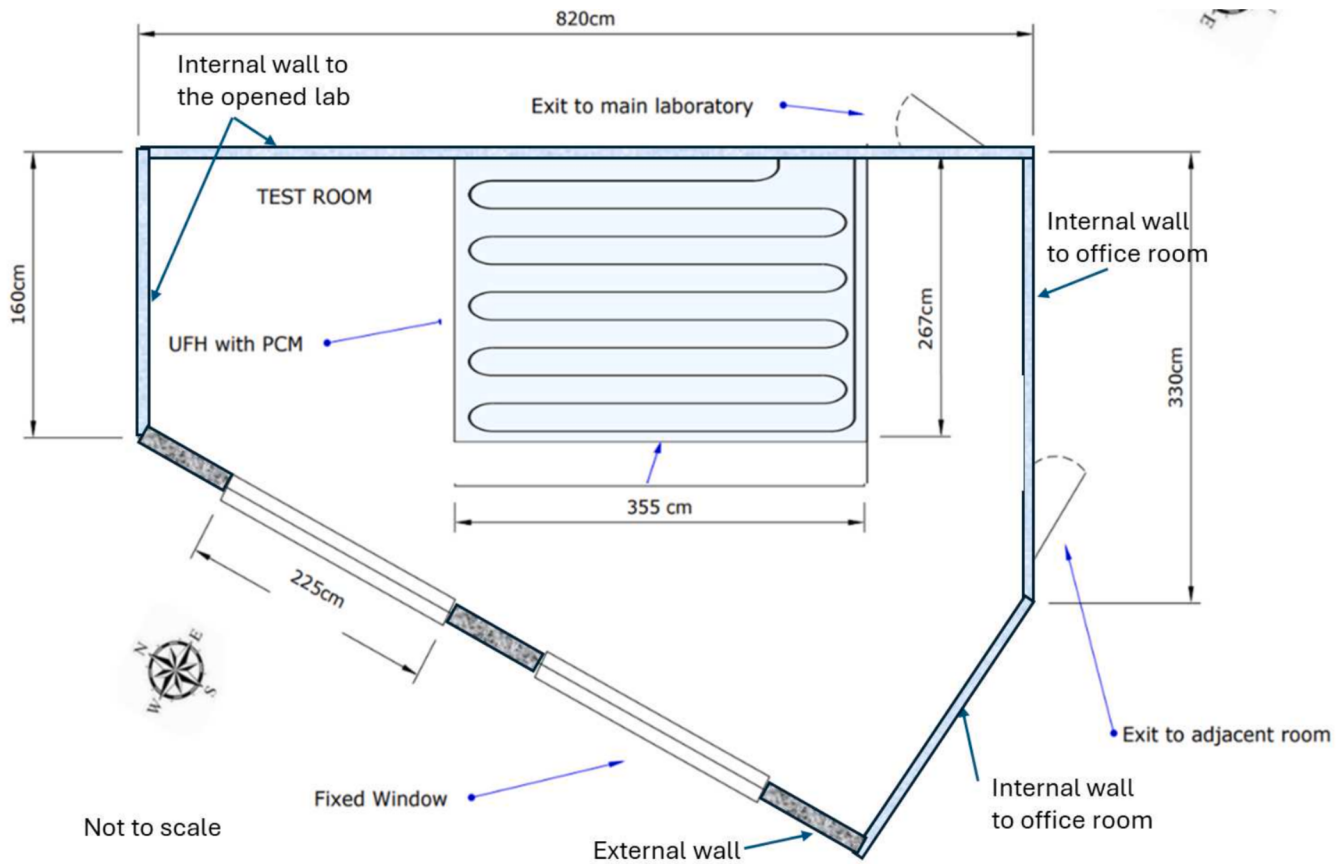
Layout of the 25 m² room area with PCM underfloor heating system.
